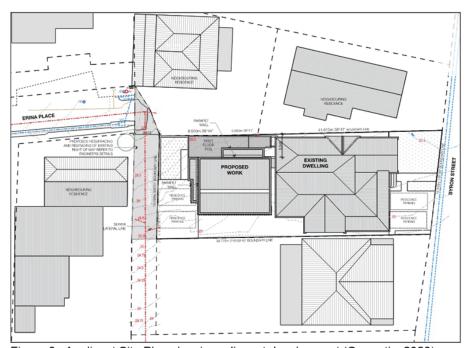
Applicant Site Plan showing adjacent development (Oramatis, 2020)
